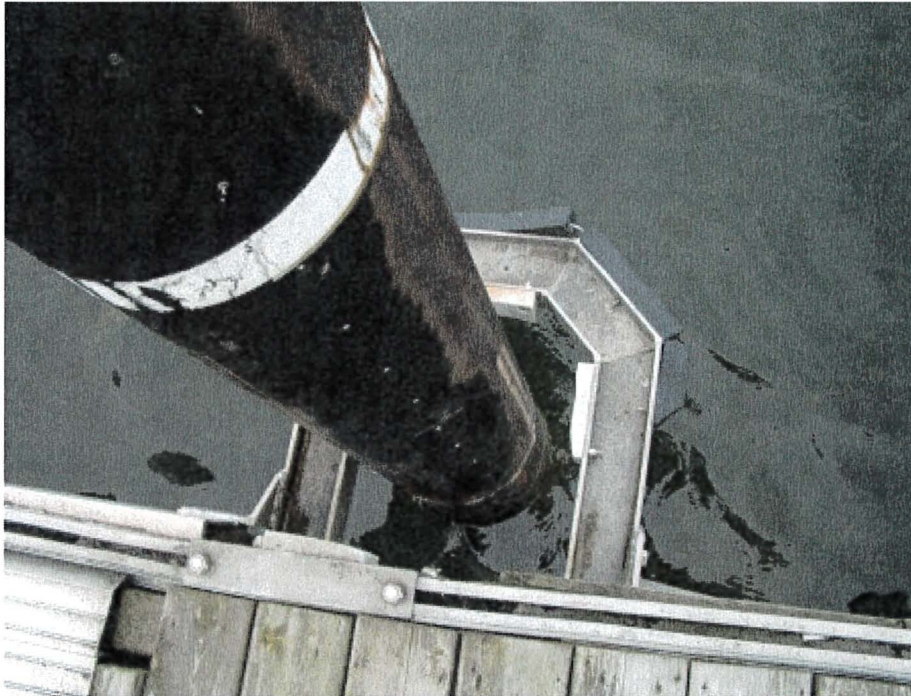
West Main – Access Gangway. Anti-slip Strap Section Missing
